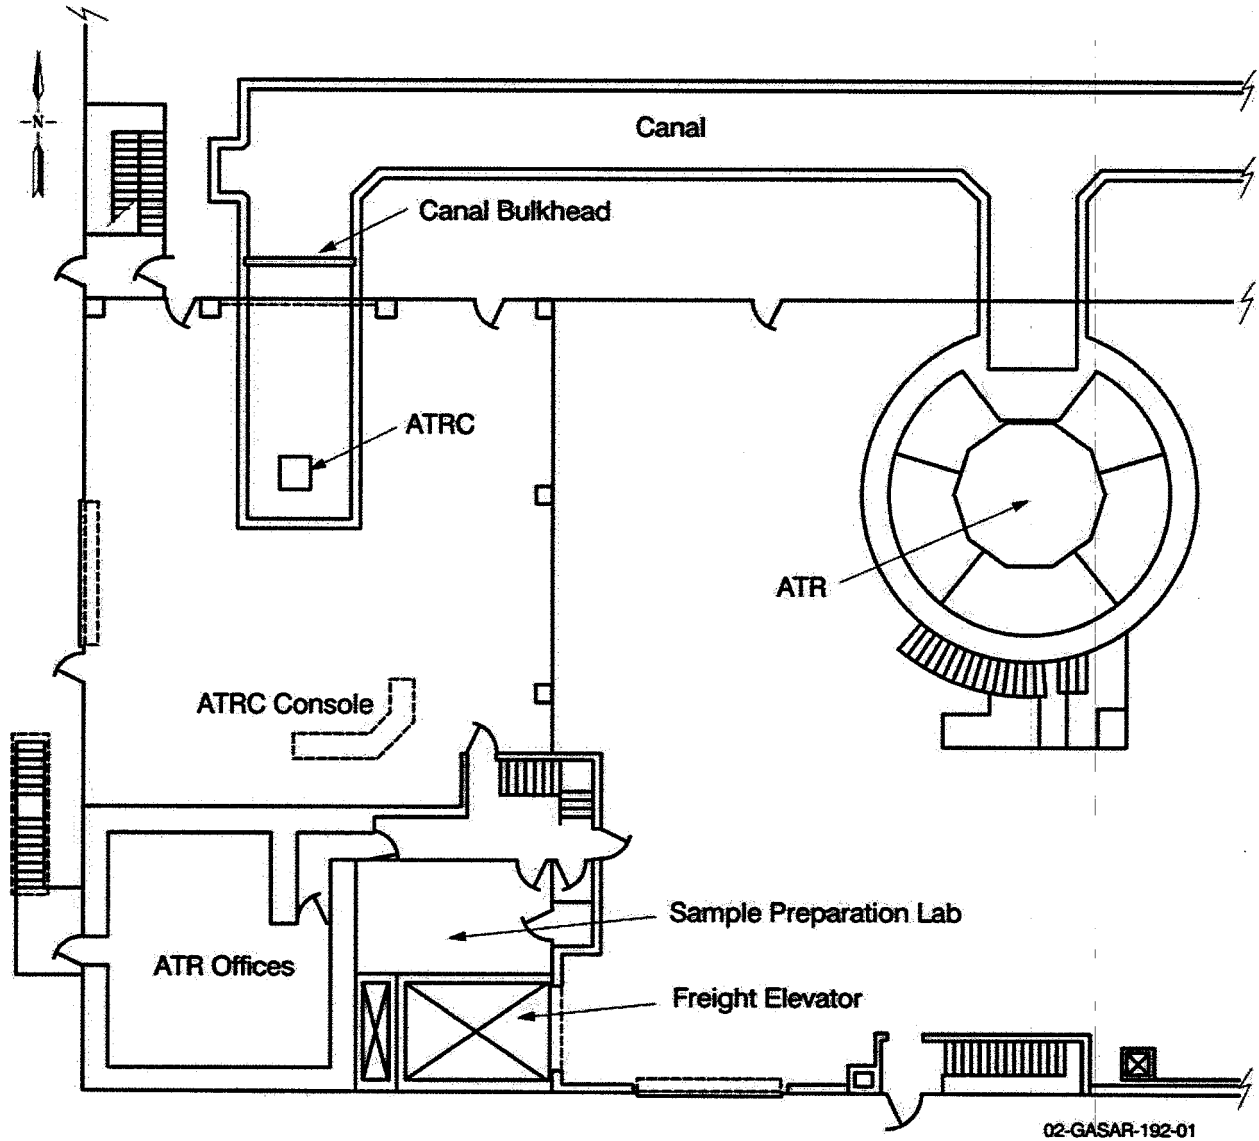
Floor plan for Advanced Test Reactor Critical Facility.
